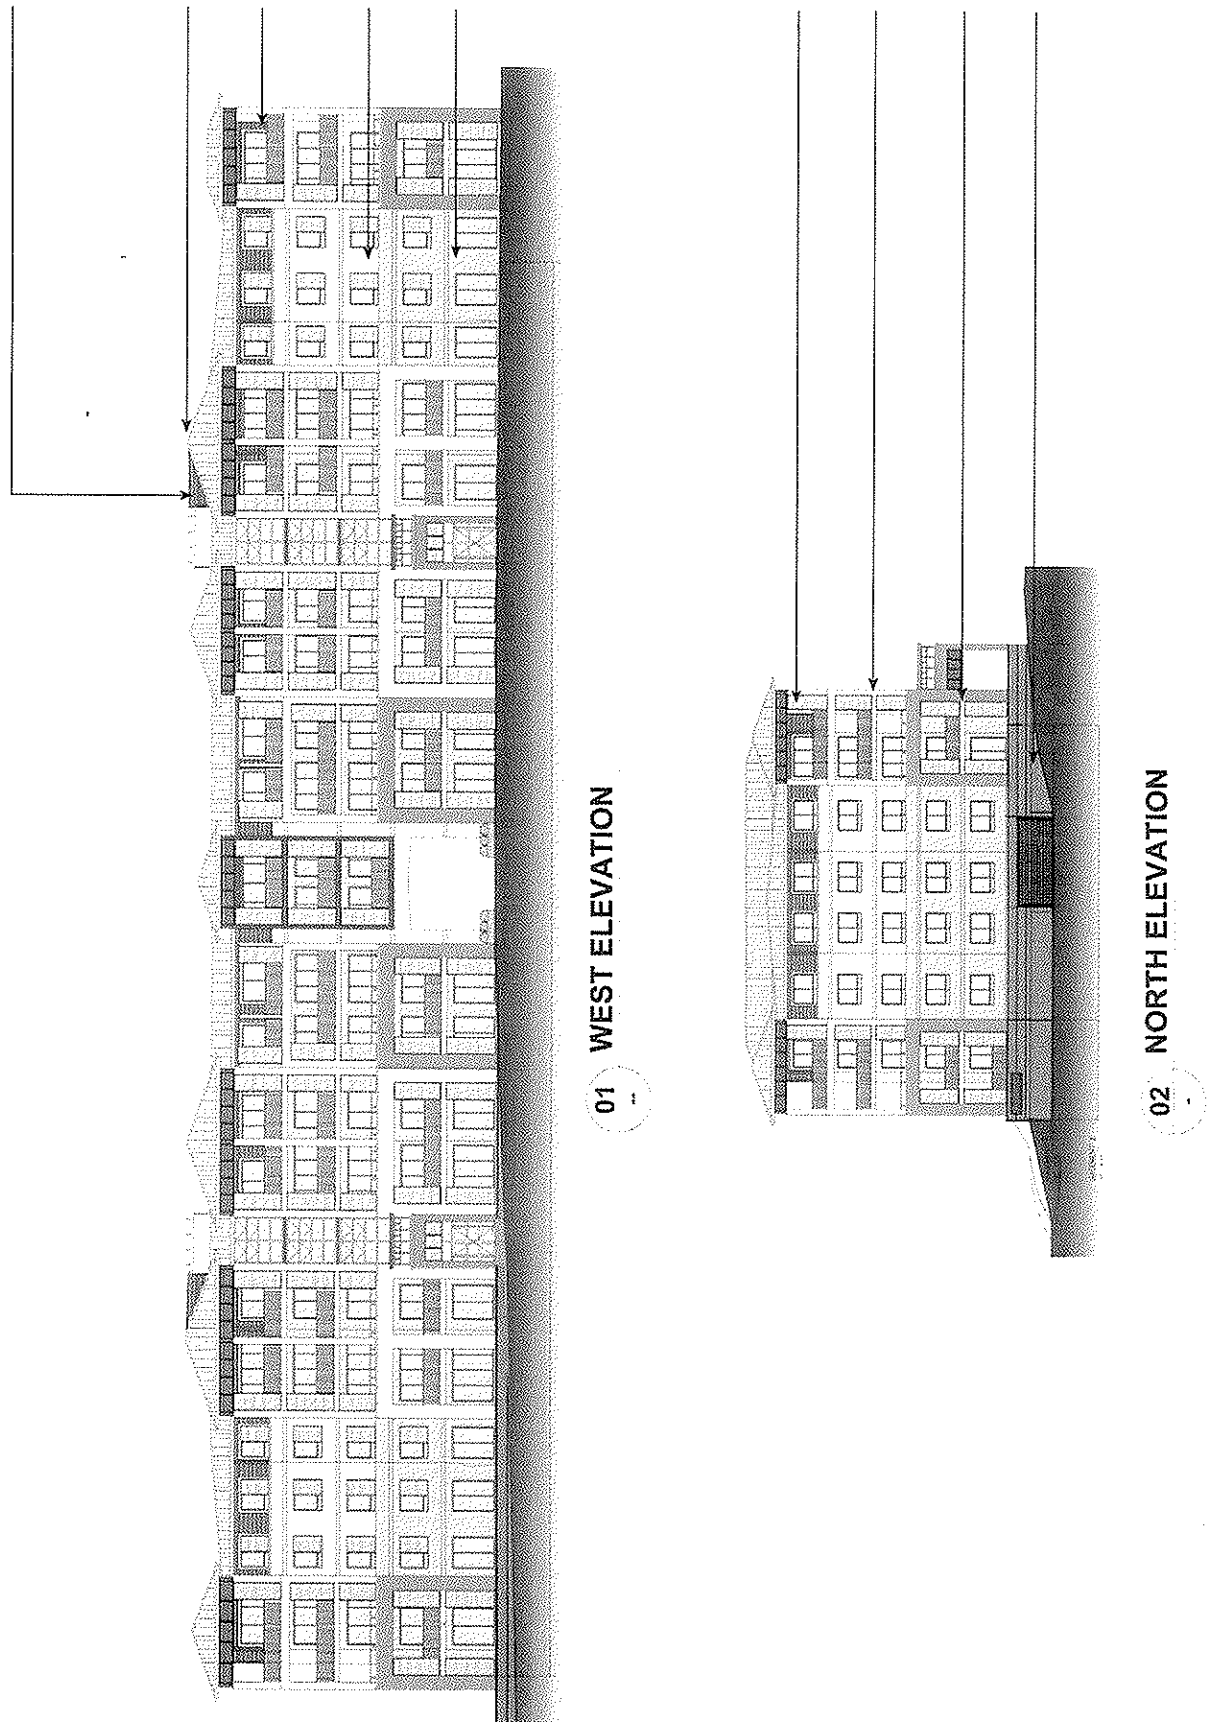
Part elevation from Vineyards Way (Building 6C2)
